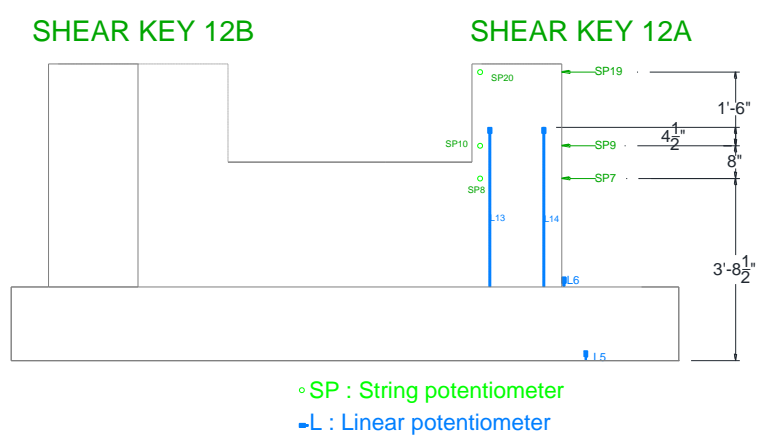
External instrumentation located on the southeast side of Specimen 12
